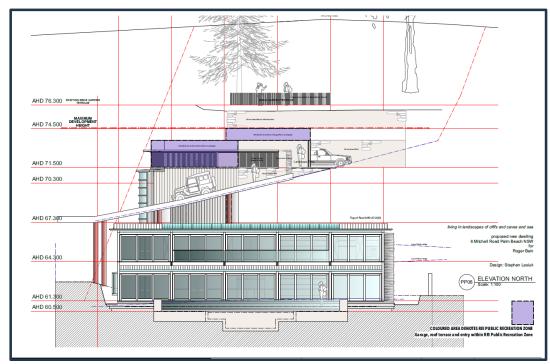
Concept Circulation Plan detailing the garage as below the Bible Garden and height limit (Souce: Housed Architects)
